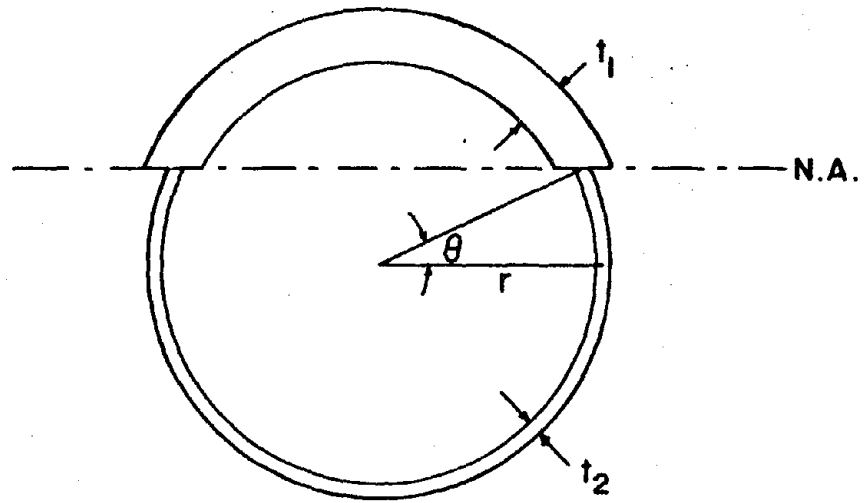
Transformed cross section of the outer shell (with cracks).
